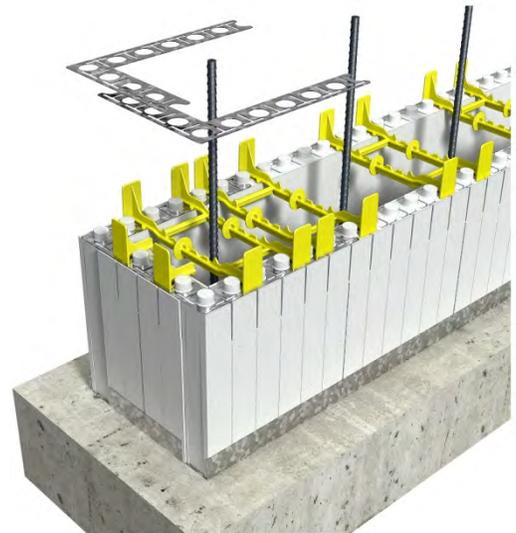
End Cap (Bulkhead) Assembly with End Cap Brackets
